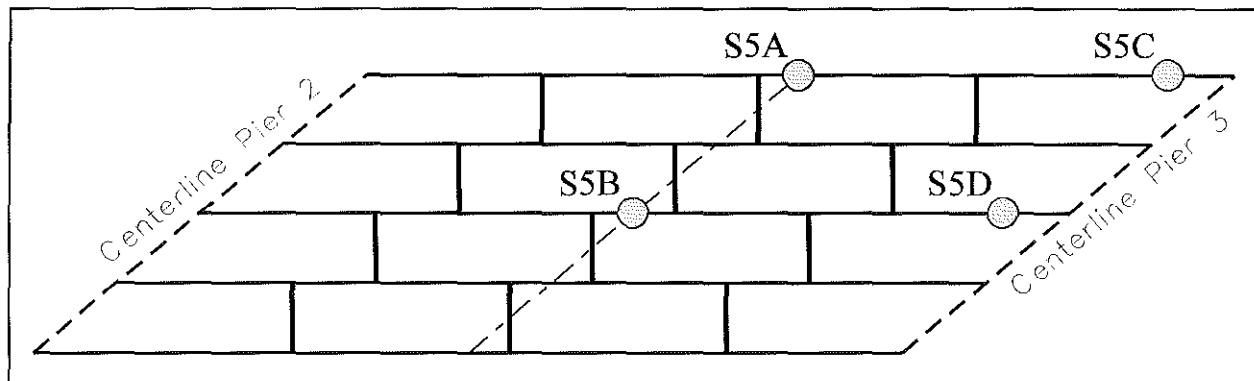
Locations for Girder Strain Gage Placement in the Southbound Bridge (Bridge With Intermediate Diaphragms).
